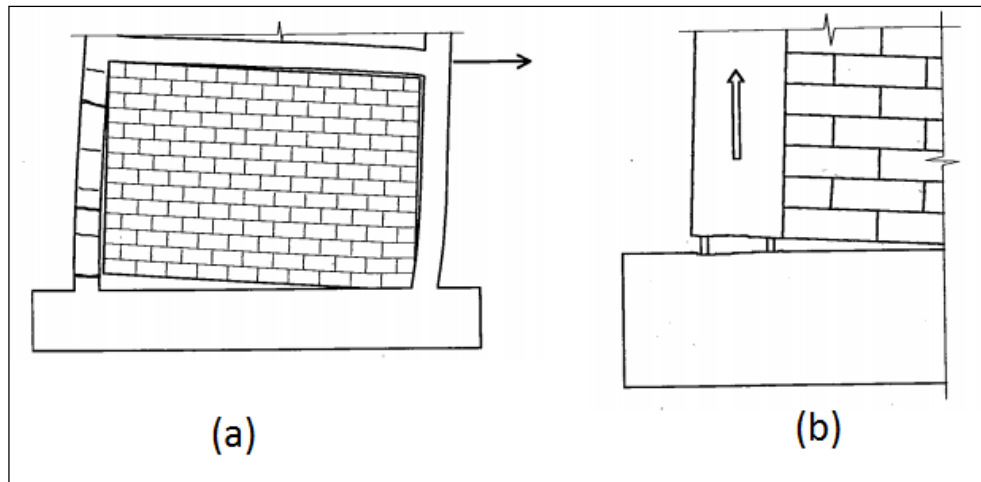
Tension failure of the column (a) and bar anchorage failure (b). (Crisafulli, 1997)
